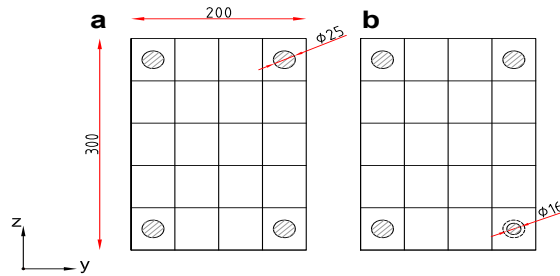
RC section details, (a) undamaged beam; (a) damaged beam.
